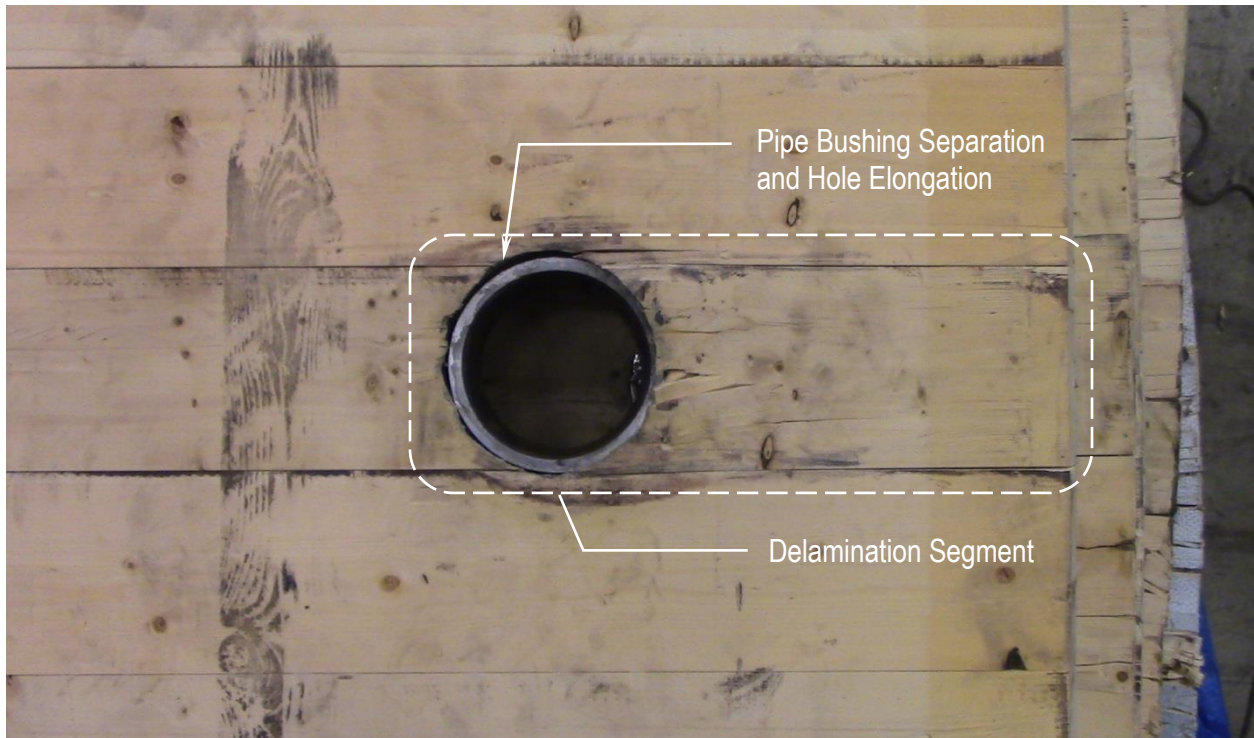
Typical damage in CLT face laminations surrounding pin hole.
